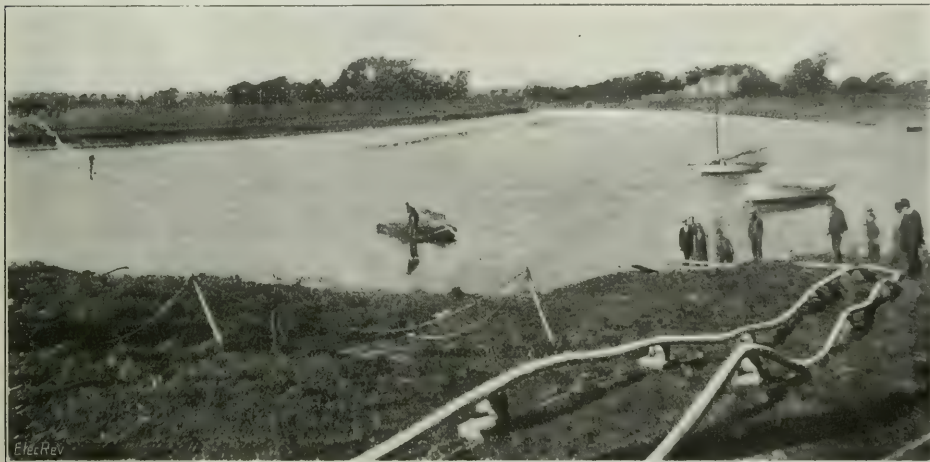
DUPLICATE 33,000-V CABLES CROSSING THE RIVER DEE.
